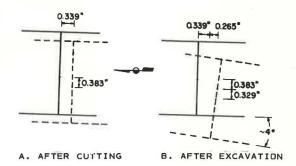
Movement of pile in horizontal plane after cutting and after excavating sand and gravel.
